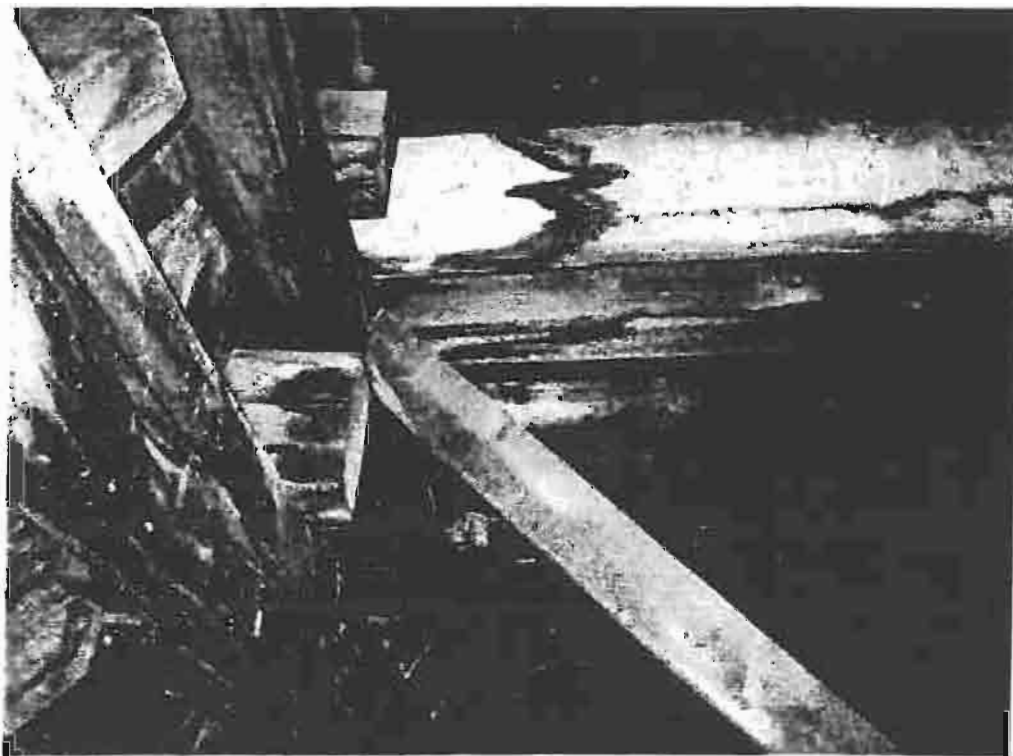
Water Stains on Roof Timber Framing. (2014-05-23)
